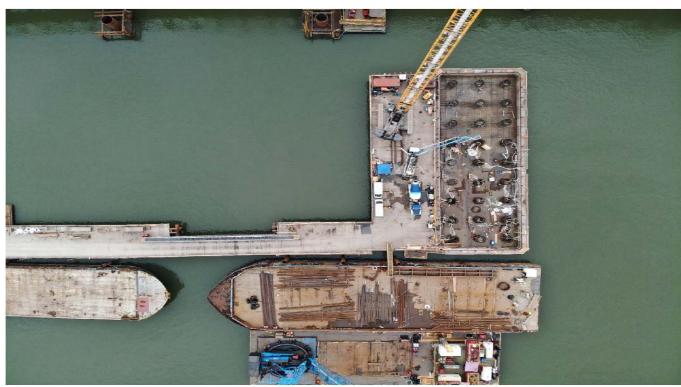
AERIAL PHOTO OF PIER S1 BRIDGE FOUNDATON PRECAST SHELL (RIGHT) AND THE PIER S1 TEMPORARY TRESTLE (LEFT)
